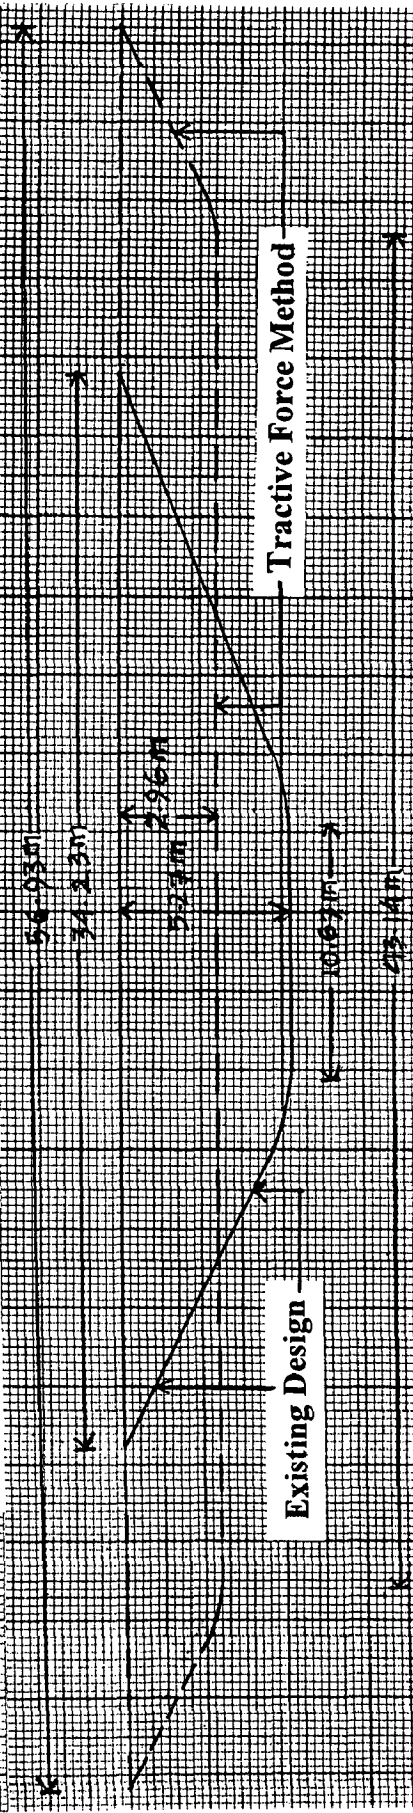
Comparison of Cross Sections of IGM for Existing Design and Tractive Force Method Between Km 384 to Km 410 (RD 1260 to RD 1345)
